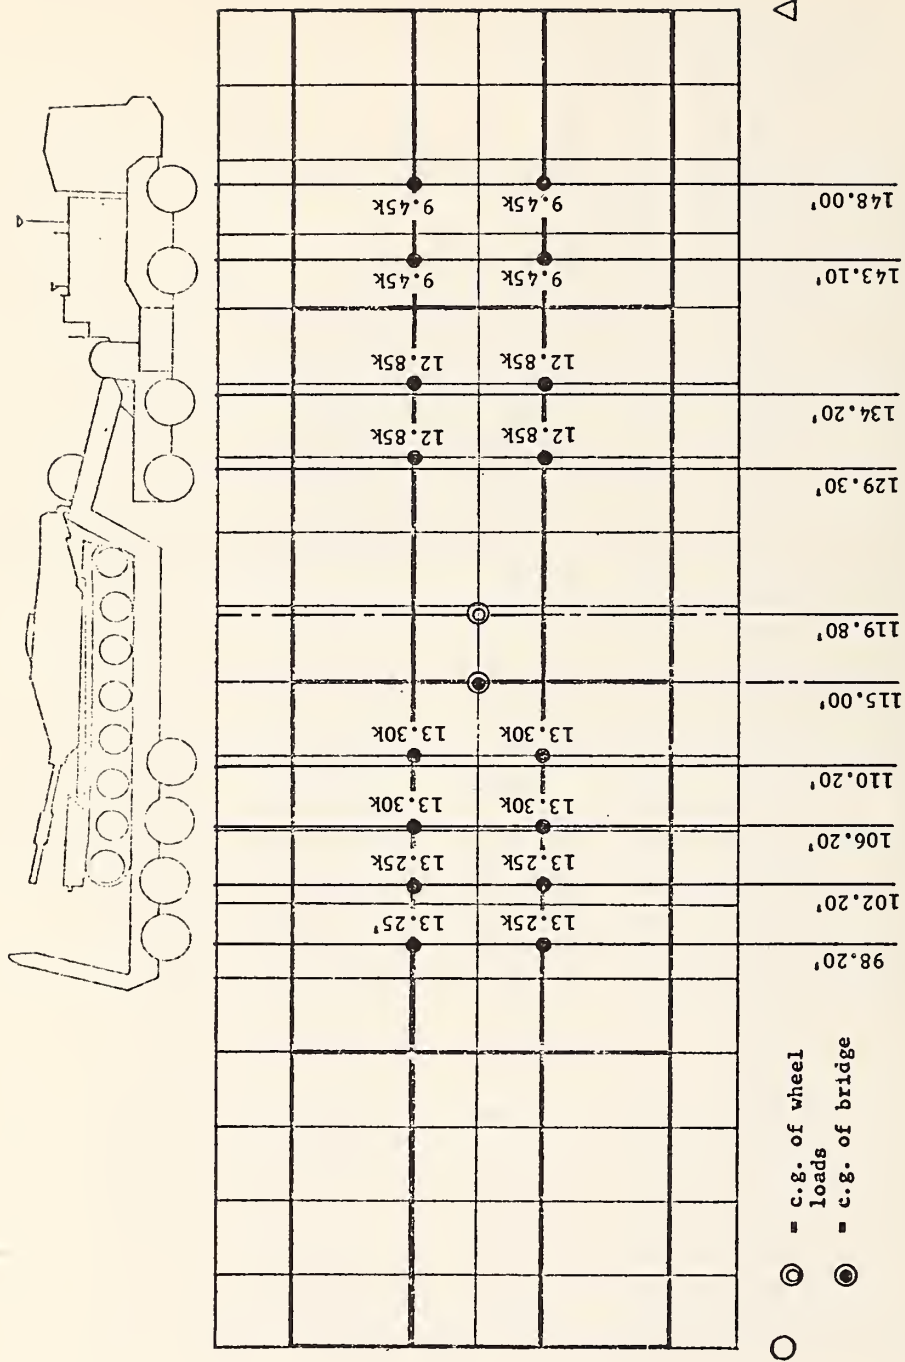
LOAD CONDITION 1, BRIDGE 1. CENTER OF GRAVITY OF HET-70 WHEEL LOADS IN LOCATION USED TO CALCULATE THE BRIDGE MOMENT OF TABLE 1.
